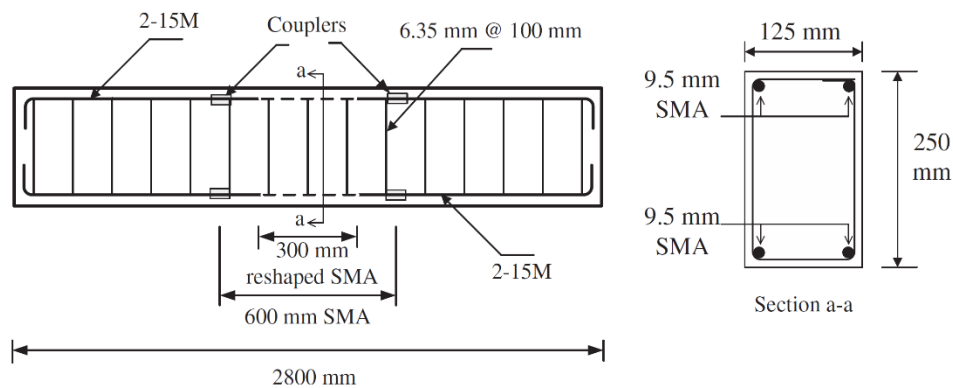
Detailing of Nitinol-reinforced concrete beam (Abdulridha, et al., 2013).
